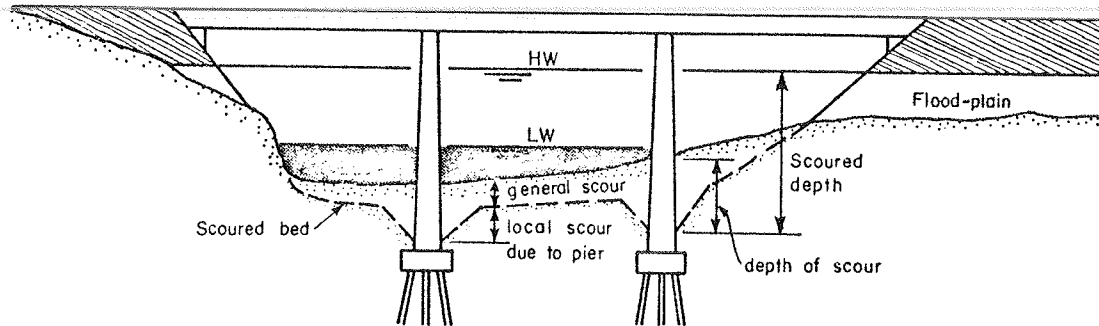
Cross-section at a bridge waterway opening, illustrating scour terminology.
